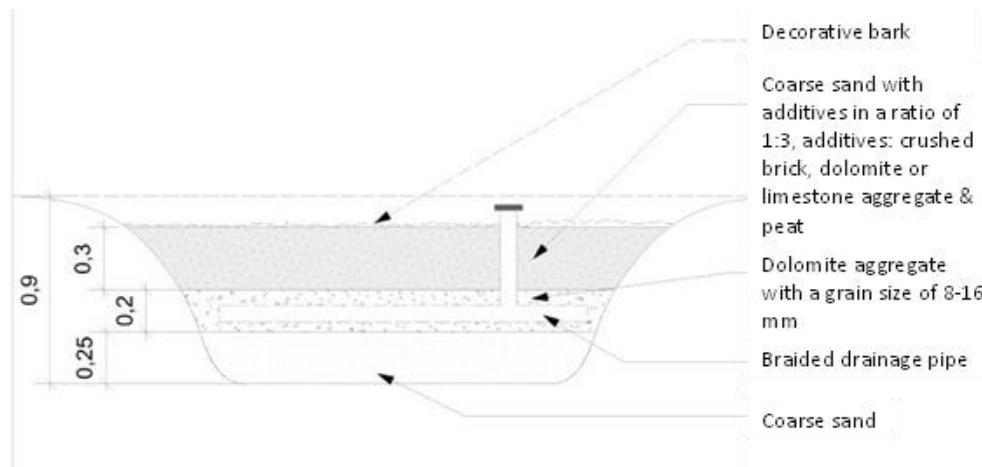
Dry garden - section, (source: City Architect's Office of Łódź)
